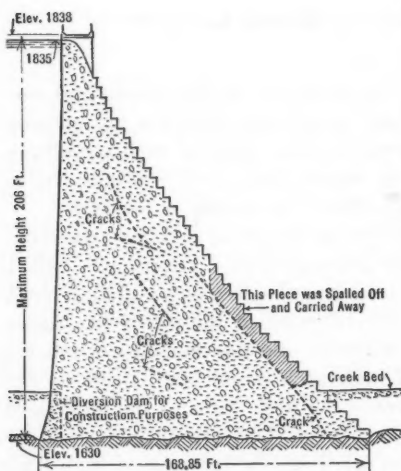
MAXIMUM SECTION, ST. FRANCIS DAM, SHOWING CRACKS.
